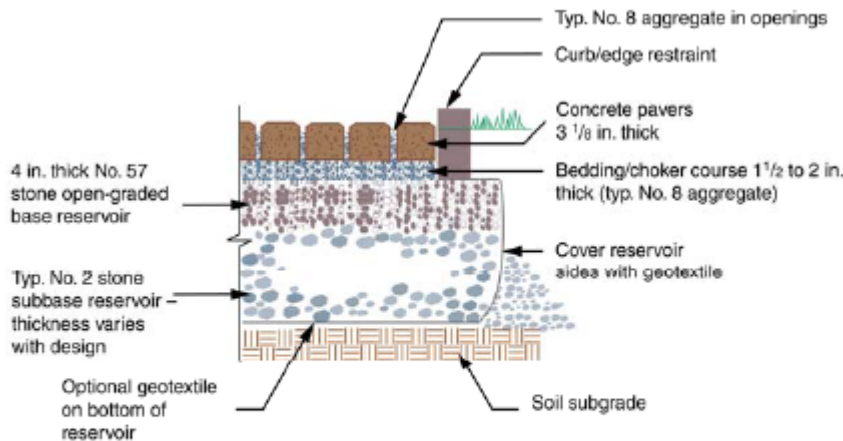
Typical Permeable Interlocking Concrete Paver
